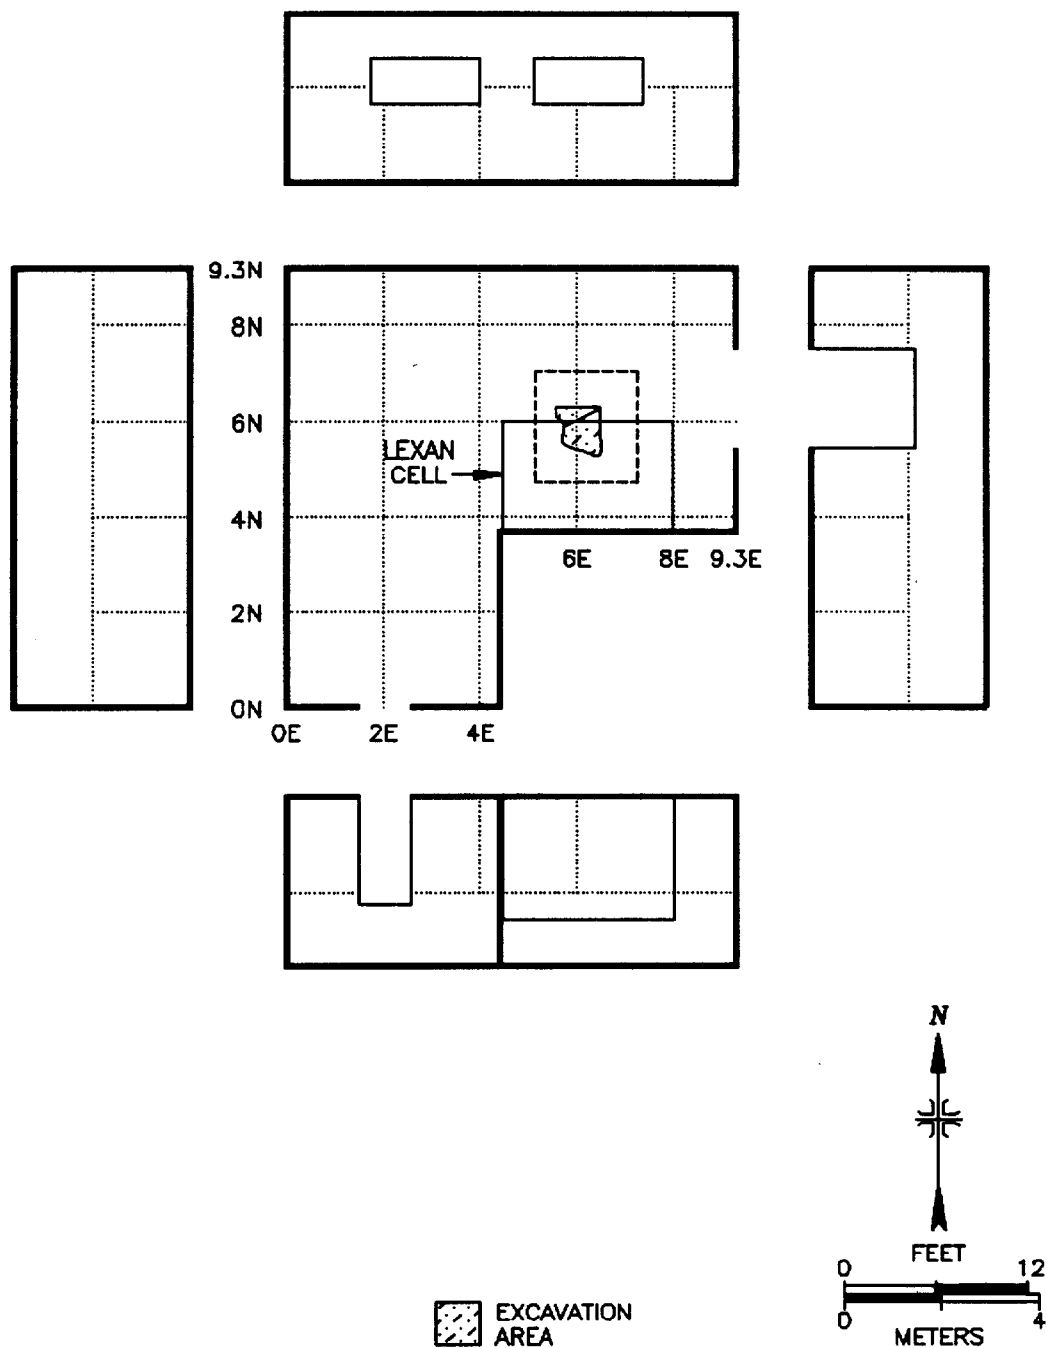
Building 28, First Floor, Lab 13 – Location of Excavation
